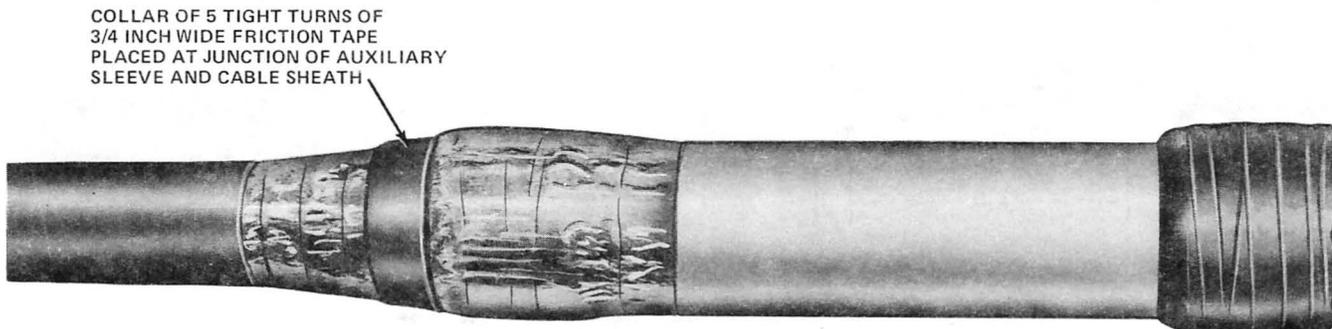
Friction Tape Collar Placed Over B Aluminum Tape
